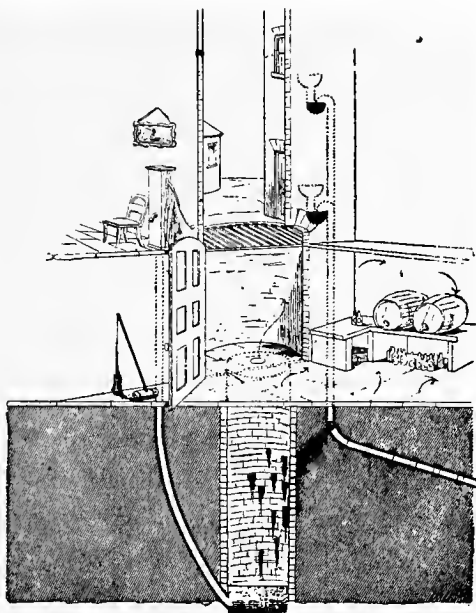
'Broken junction of drain and soil pipe, and fouling of well under a house.
